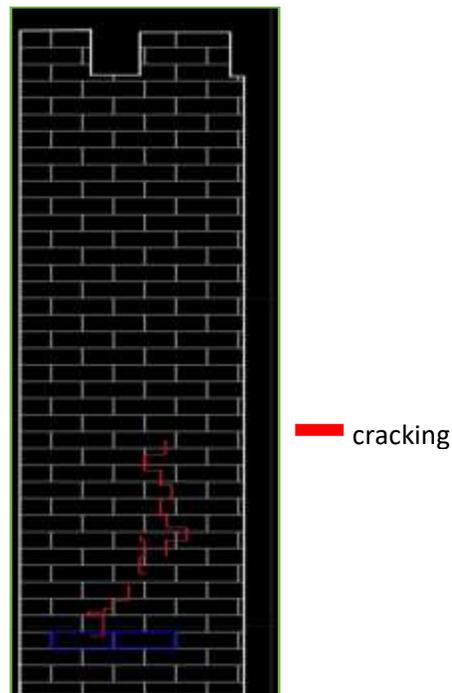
shows the damages on the Eastern Facade of the Northern Tower.
